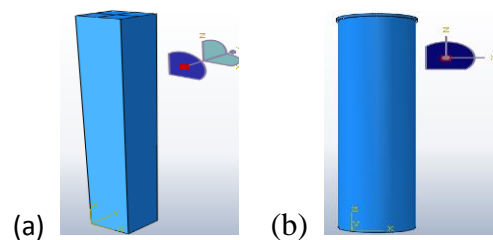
Reinforced concrete column (a) and strengthened of column by steel jacket(b)
